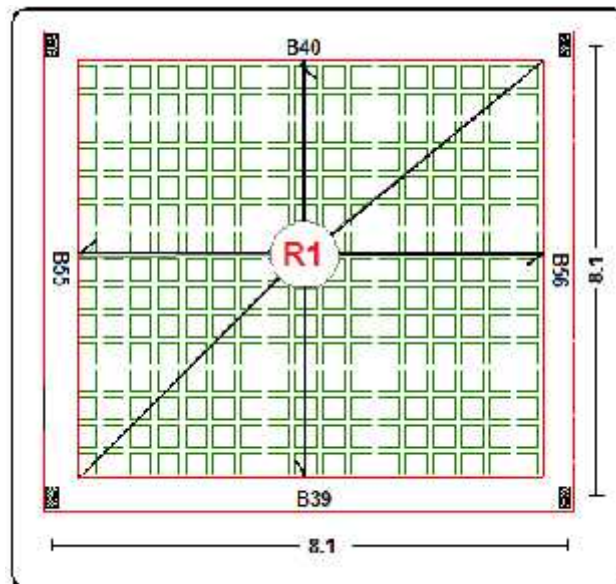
Two Way Ribbed Slab with 28cm Thickness (KN.m).
